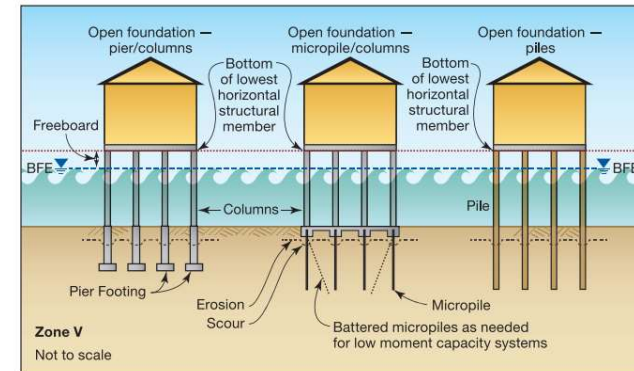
elevated foundation types above BFE (Source:FEMA)
